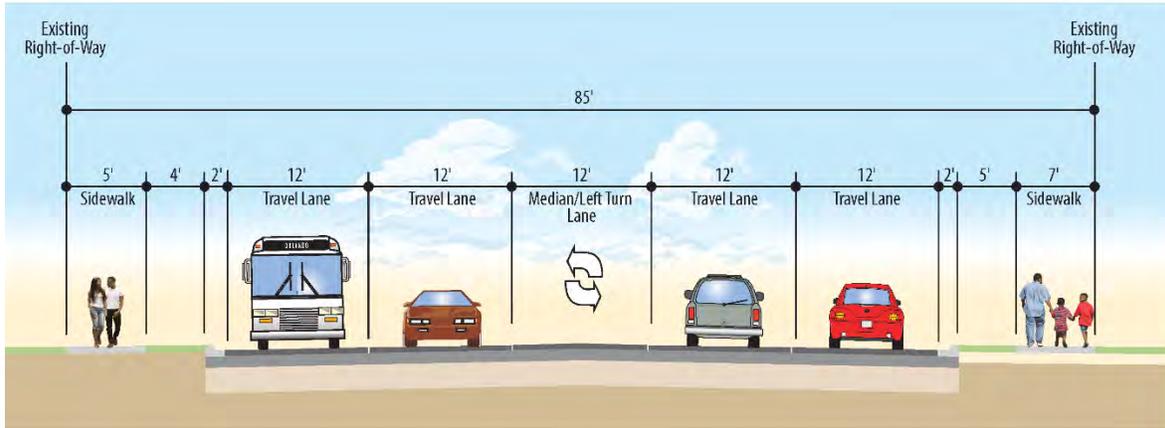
No Build Alternative Typical Section: Silver Star Road to Bonnie Brae Circle
